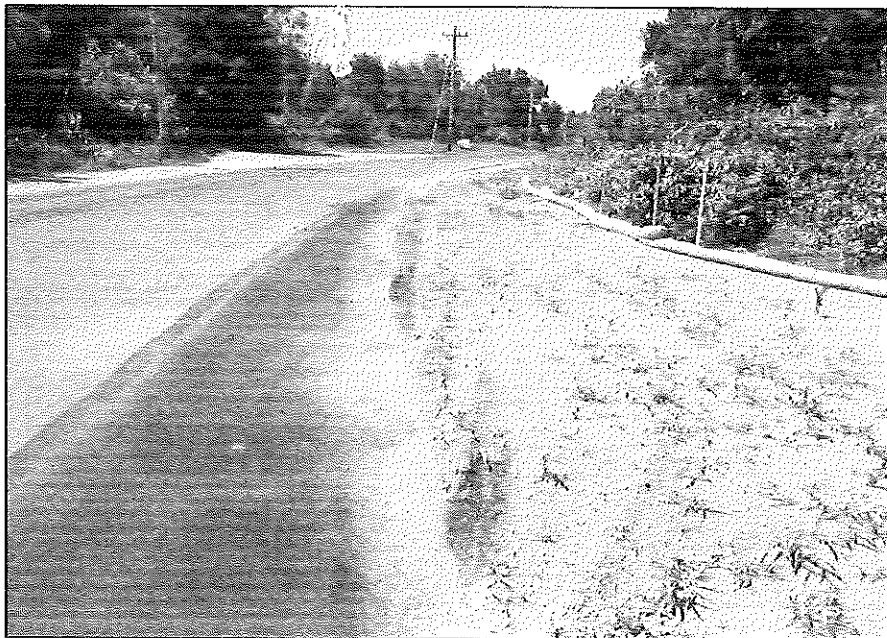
Southwest corner of Wheeler Street – cracked sidewalk
